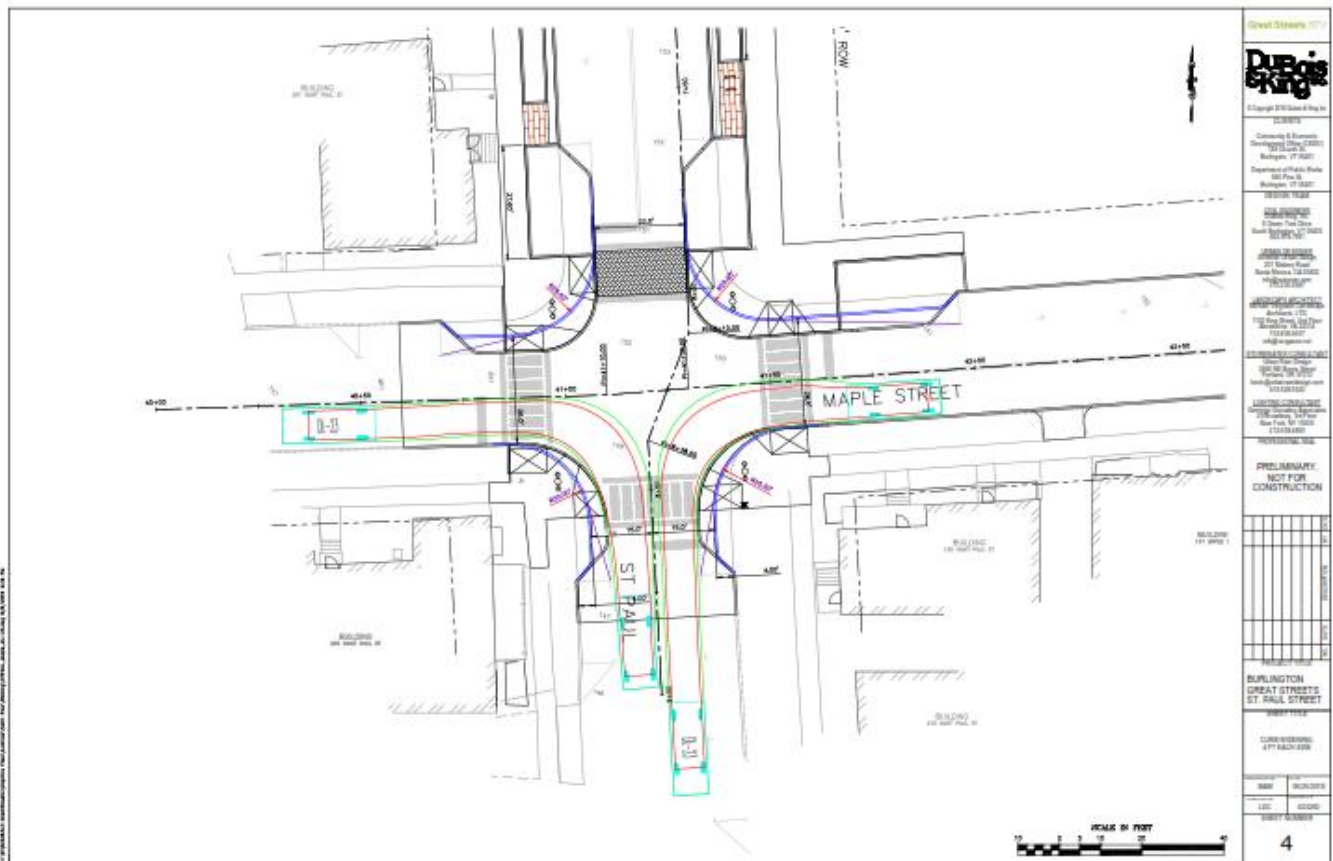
Maple Street and St.Paul Street-20' Curb Radius, 8' widening of northbound approach
